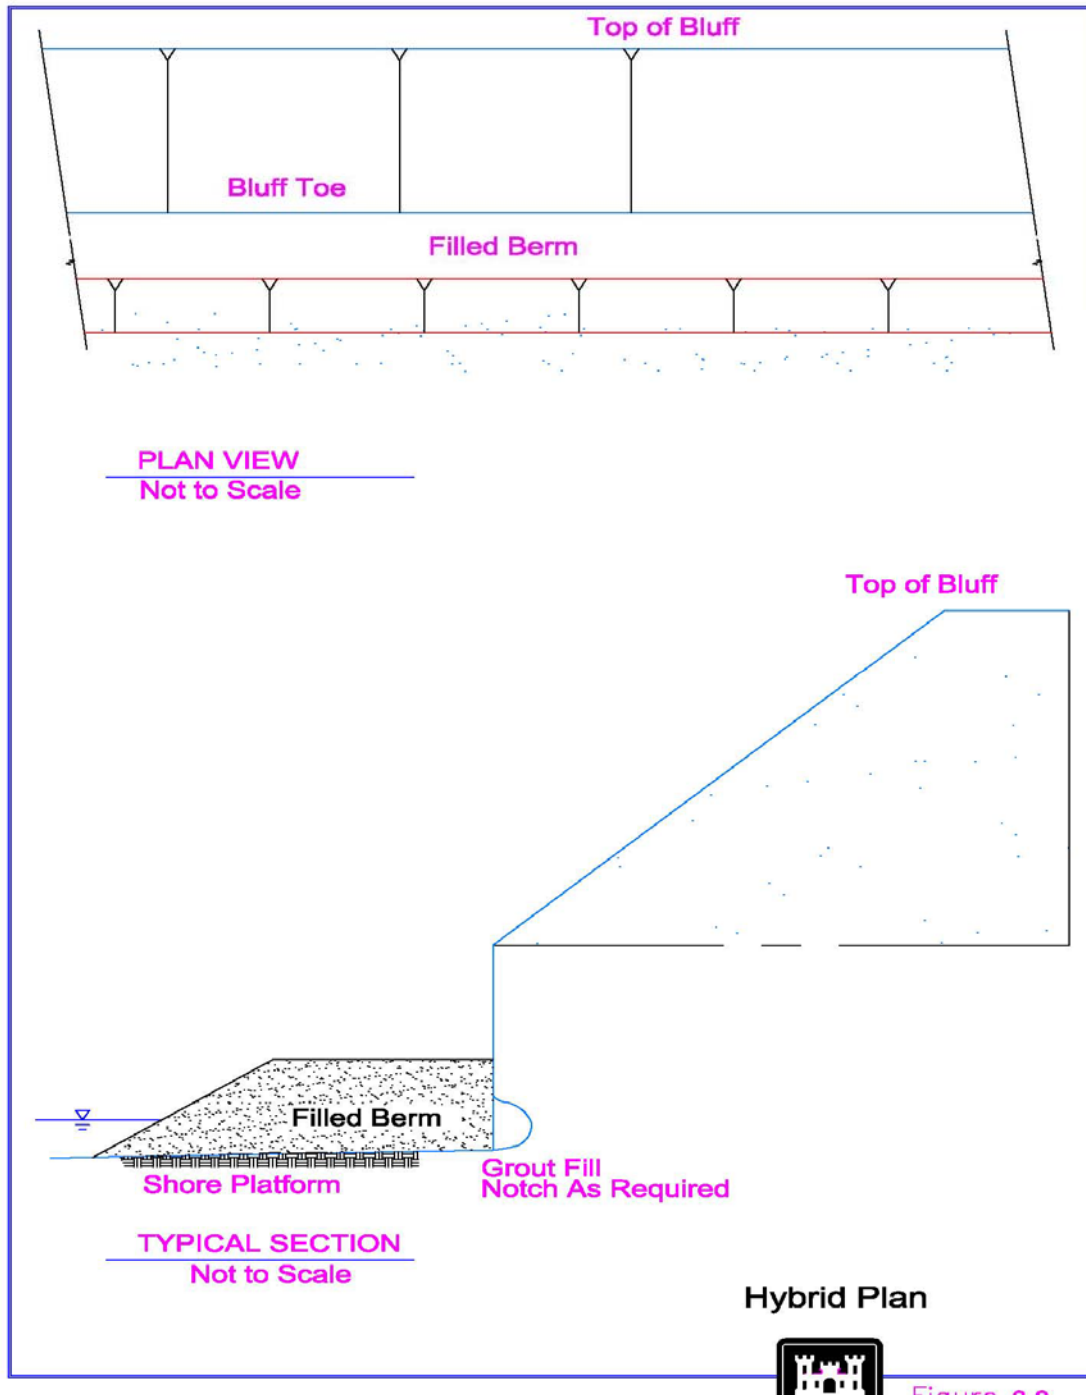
2 CROSS SECTION BEACH FILL SEGMENT ONE (HYBRID PLAN)
